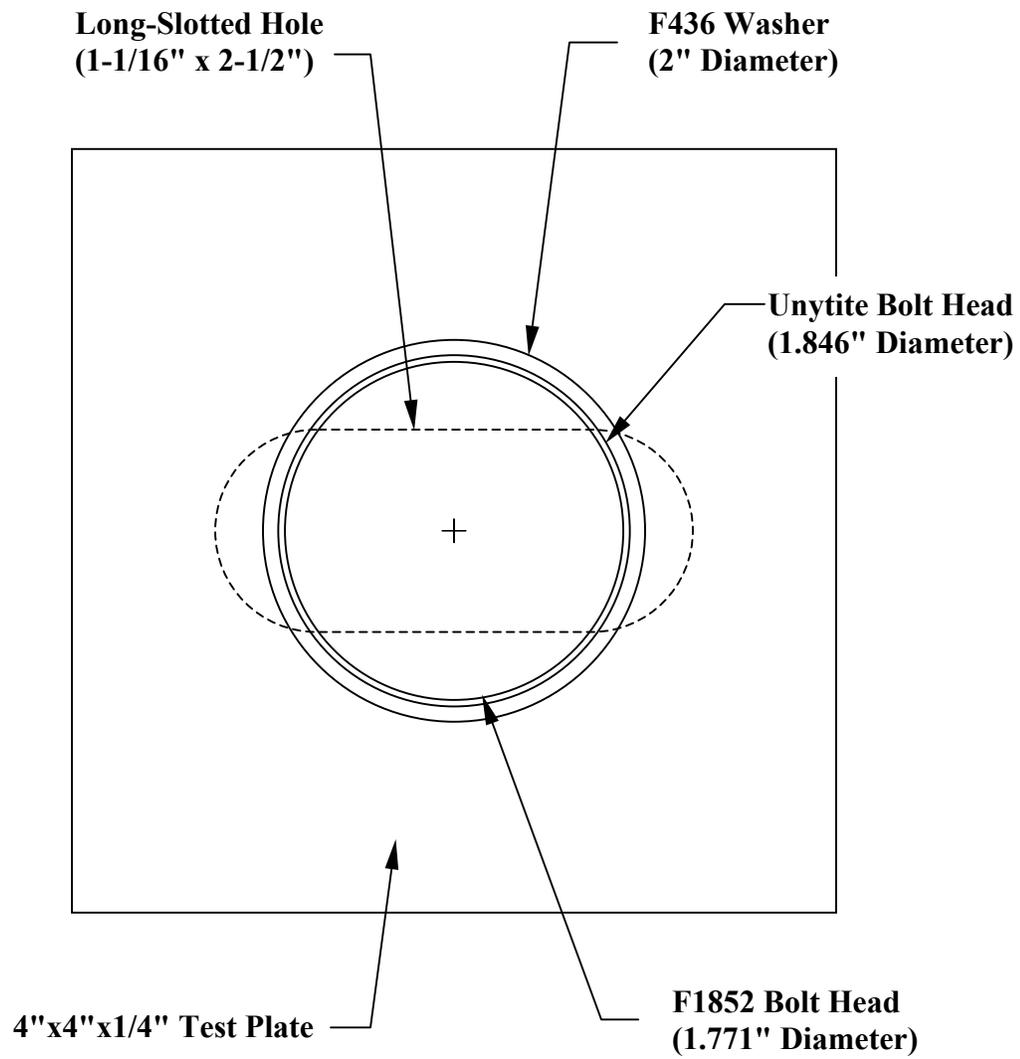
Bolt and Plate Layout for 1" Bolt in Long-Slotted Hole
